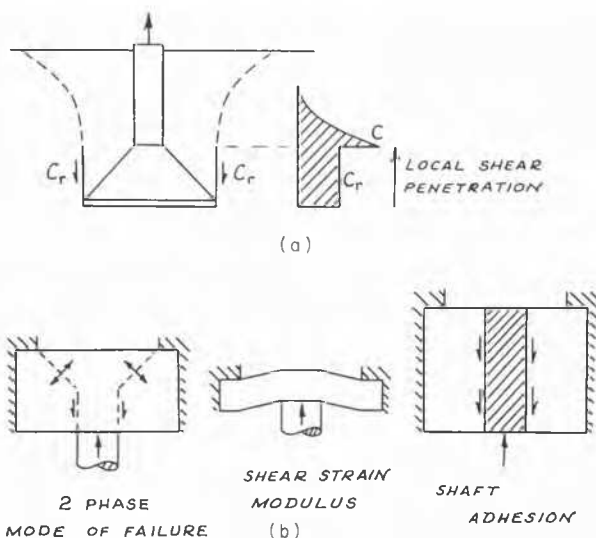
Example of transition to an alternative failure mechanism. (a) Uplift foundation; (b) punching shear test.
